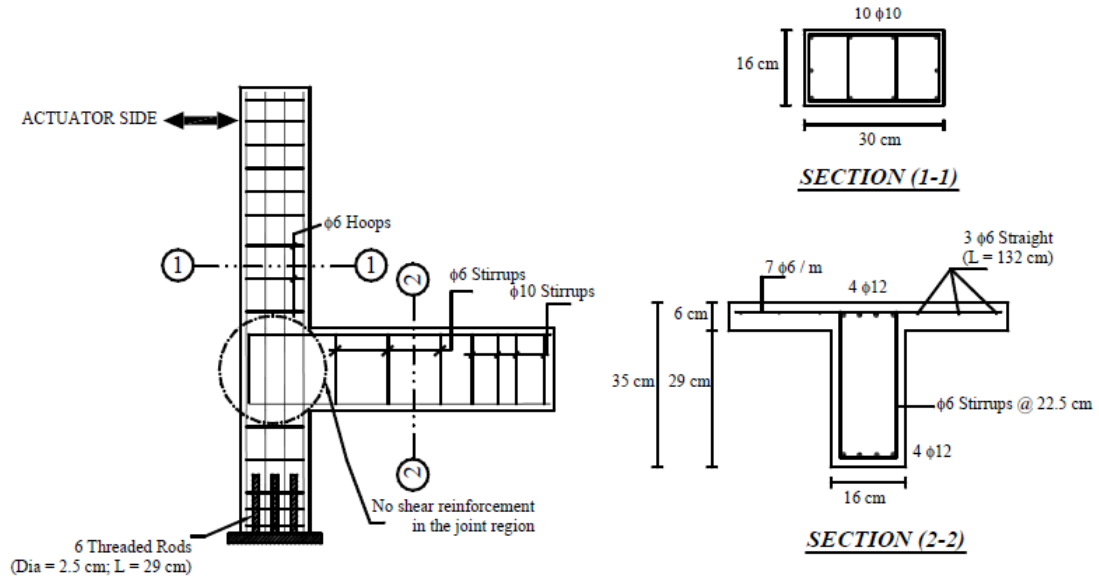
Reinforcement Details of the As-Built Specimen [10]
